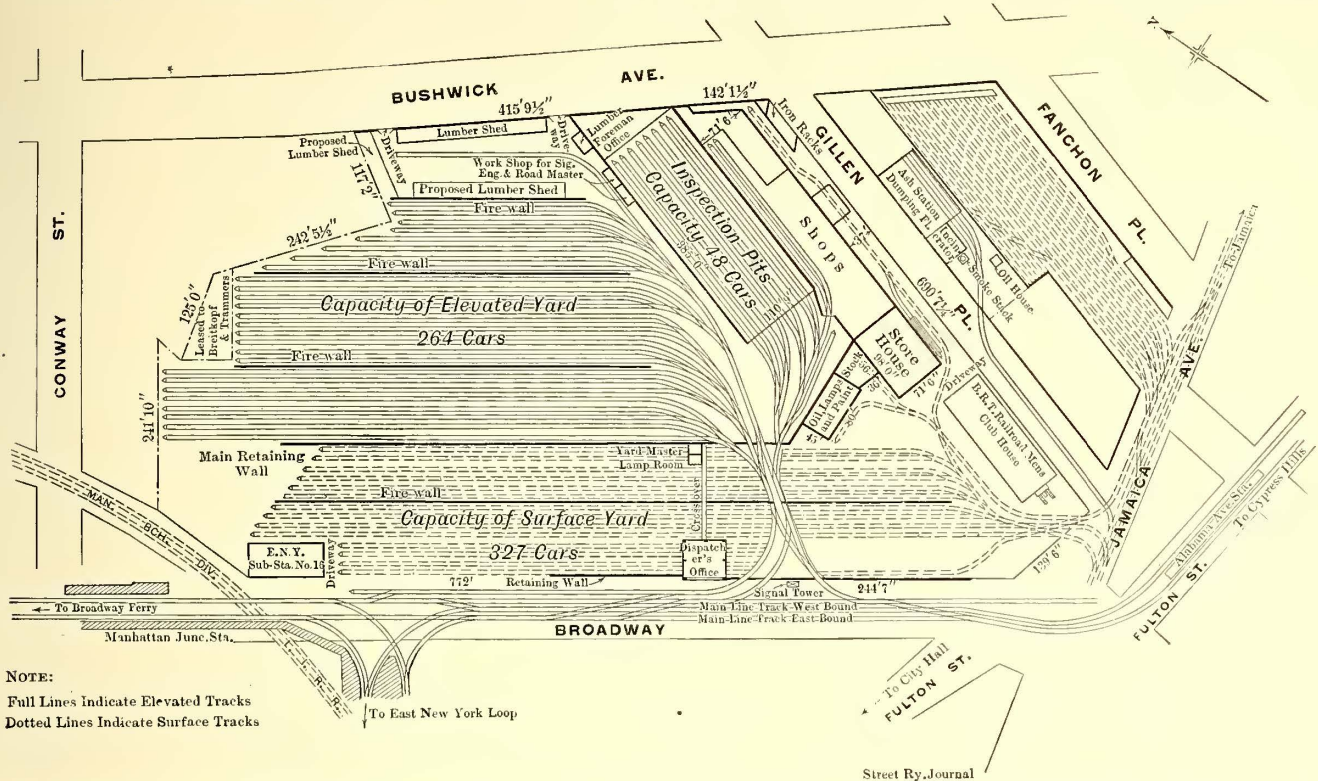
GENERAL LAY-OUT OF THE TRACKS AND BUILDINGS OF THE EAST NEW YORK INSTALLATION
